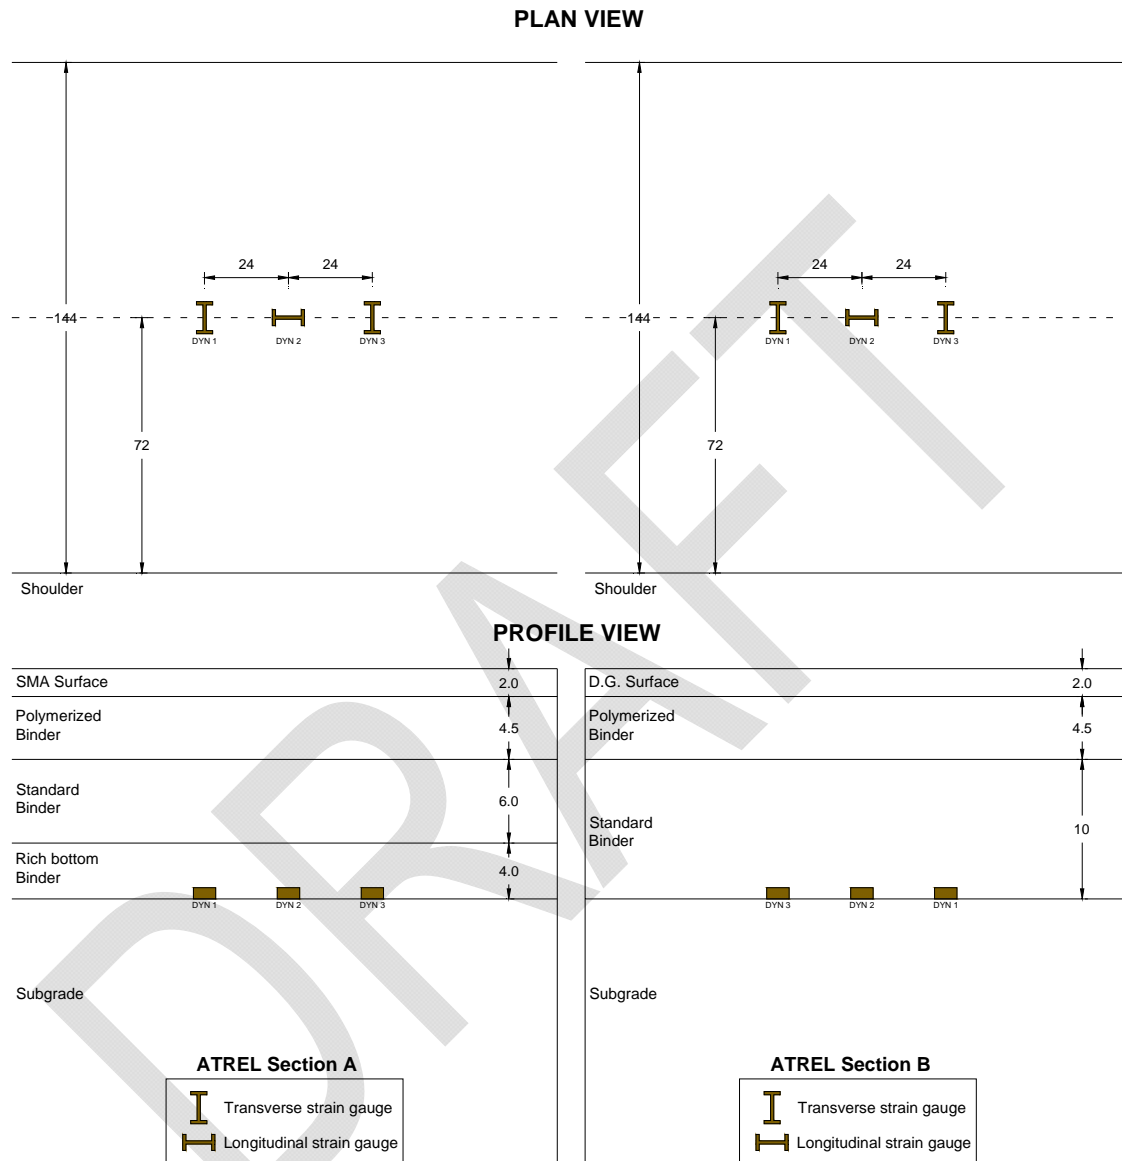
Plan and profile view of pavement structure and instrumentation Sections A and B, ATREL-UIUC full depth pavements.
